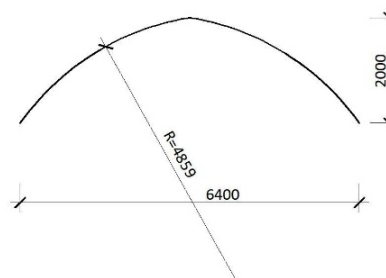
Shape of the 'Gothic' roof of the plastic tunnel, adapted from [3]
